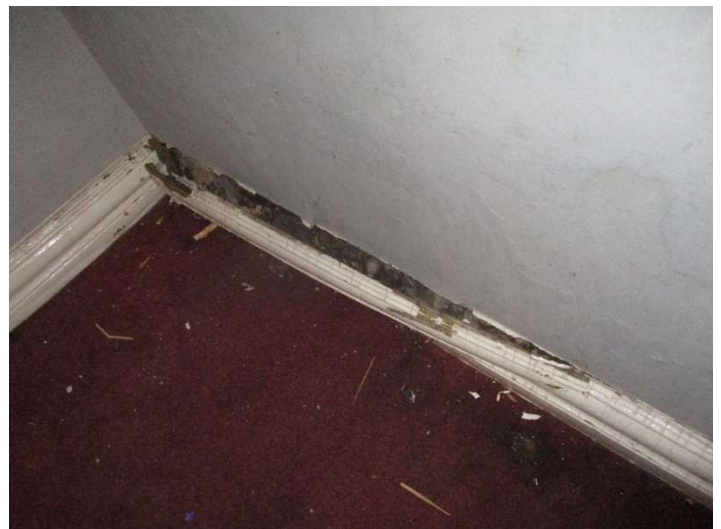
Rear block – dampness to wall to left side elevation and wet rot timber decay to skirting board
